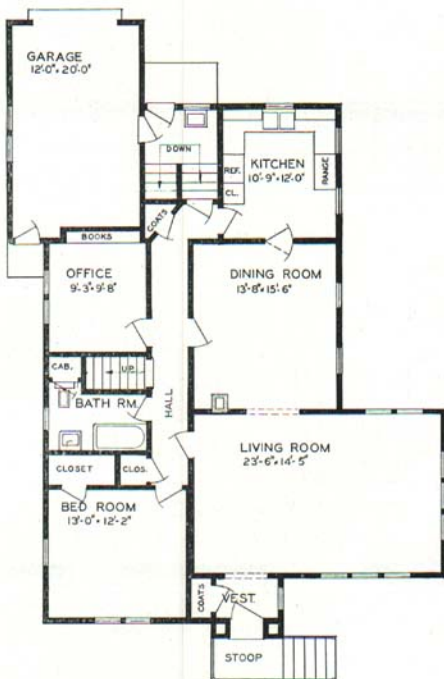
Remodeled house plan. Note the convenient kitchen arrangement.
